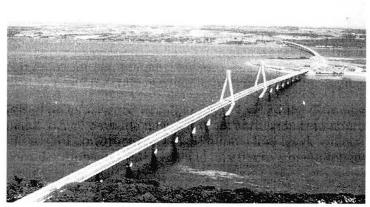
An overview of the Faroe Cable-Stayed Bridge
